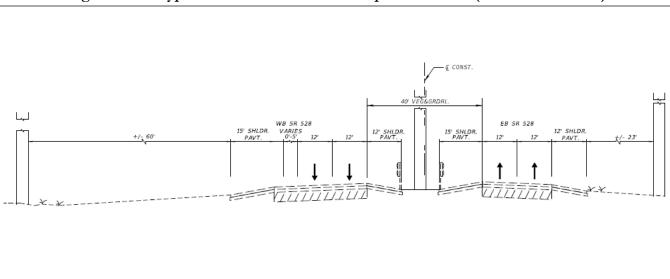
Typical Section at SR 528 Underpass at SR 417 (Structure #750373)
